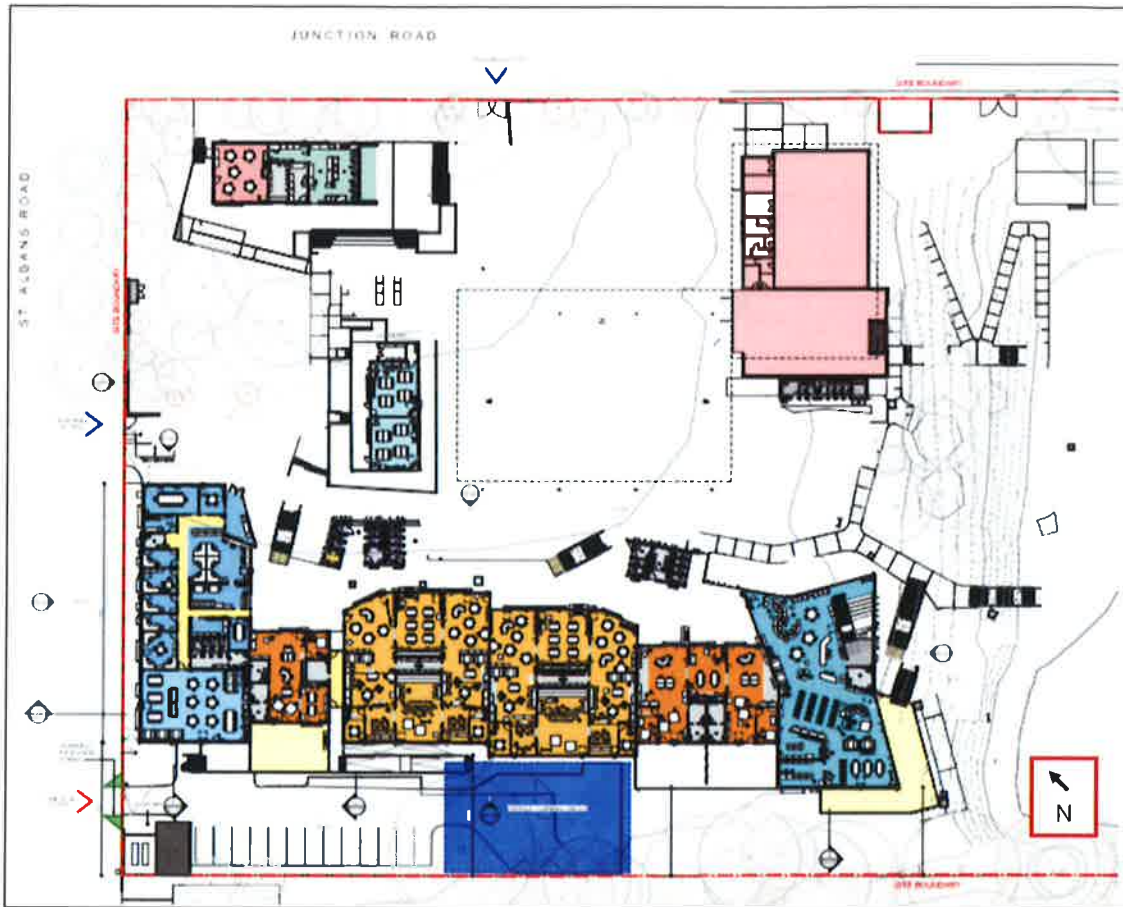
| Approved Ground Floor Plan (Base Source: SSD-8740 Application 2018)
